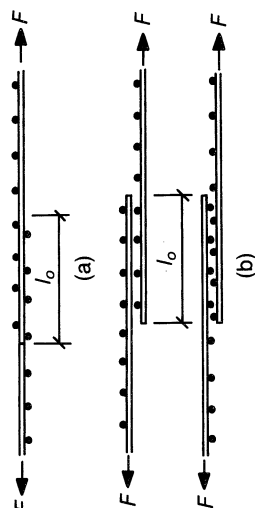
Lapping of welded fabric: (a) intermeshed fabric (longitudinal section); (b) layered fabric (longitudinal section)
